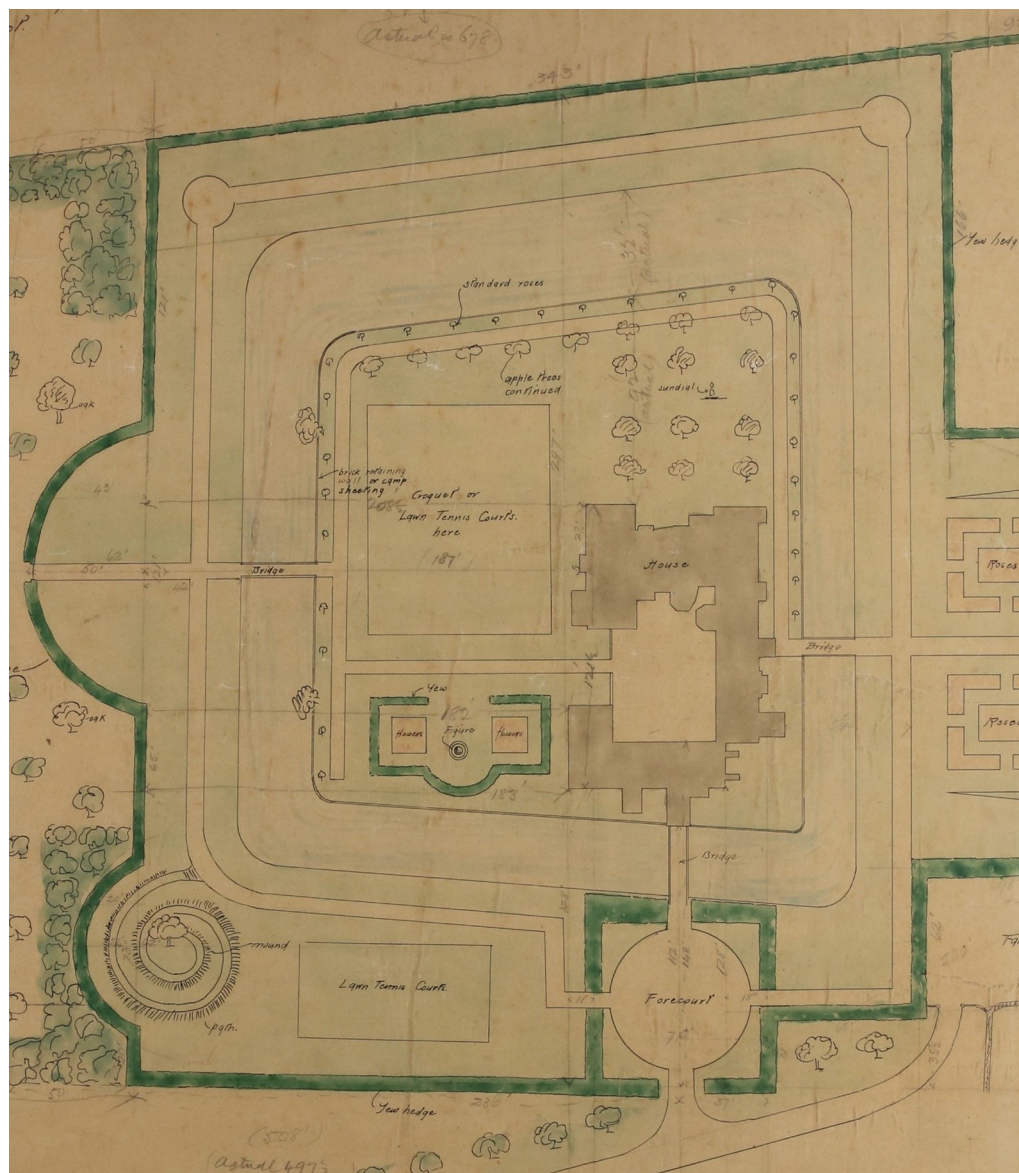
Detail from proposed plan for the redesign of Little Moreton's grounds (c.1890s). Cheshire Archives & Local Studies, D6906/1, 'Moreton Old Hall, Cheshire, Scheme for Laying out of Grounds round House' (image provided courtesy of Cheshire Archives & Local Studies).
